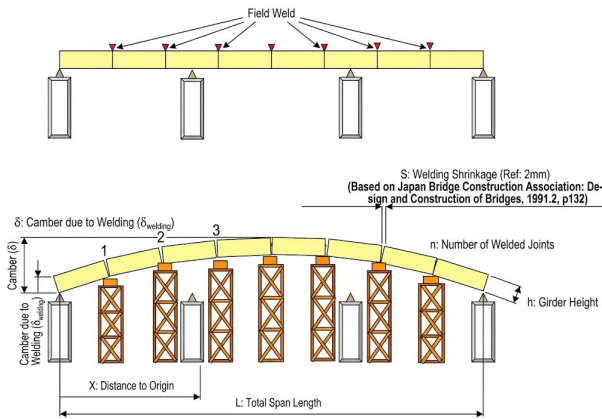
Calculation of welded camber by welded shrinkage
